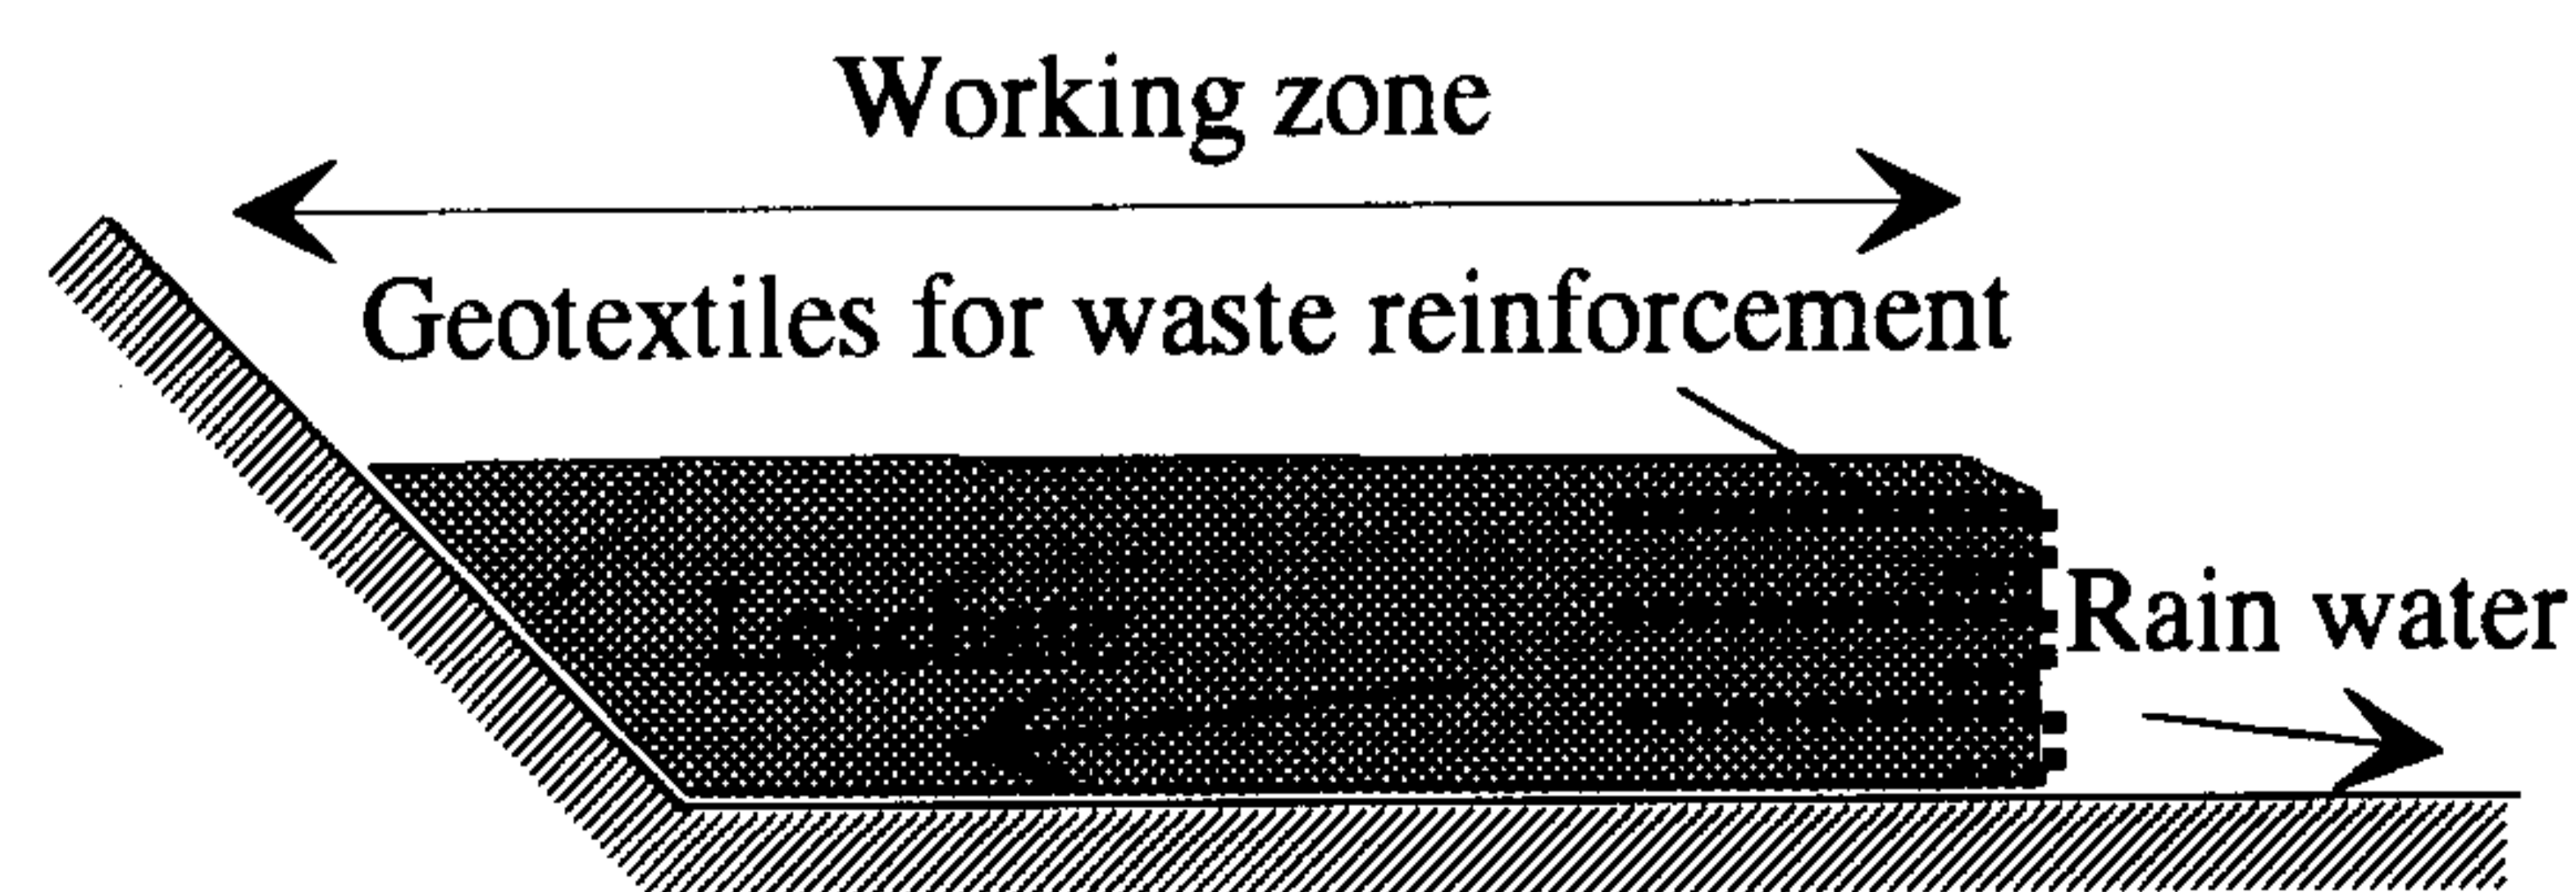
Internal separation dyke with wastes reinforced by geotextiles at the Pontailier landfill.
